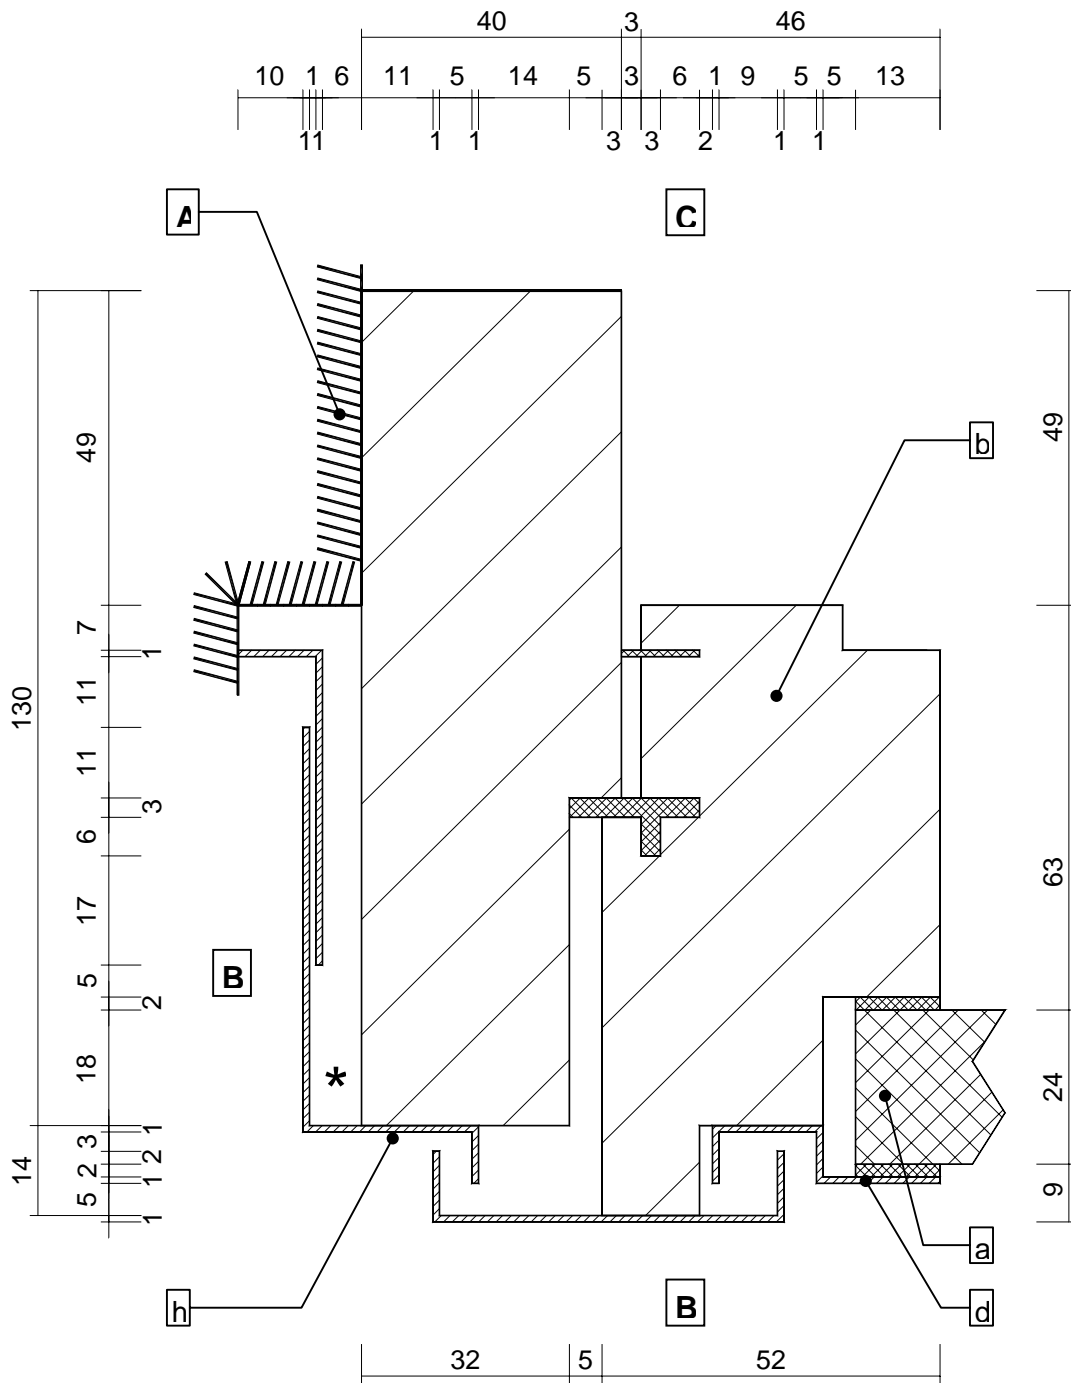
Roof window frame section and insulation panel (bf= 89 mm)
